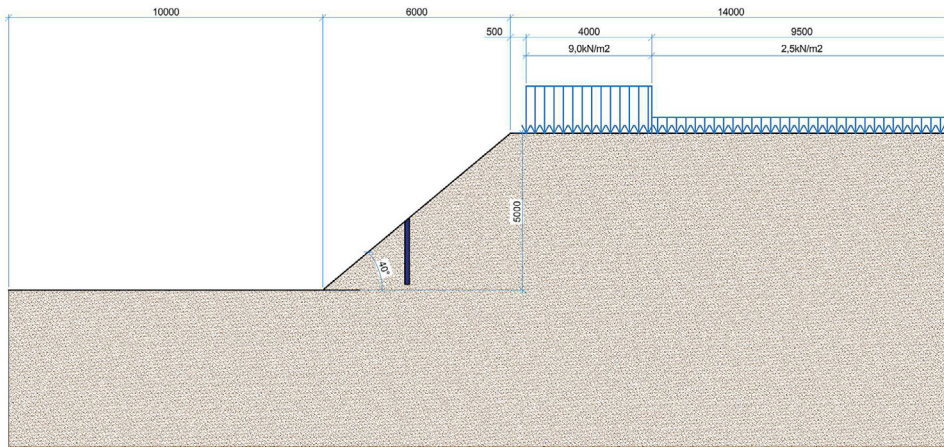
Calculation scheme of the road embankment slope reinforced with geopolymer columns
